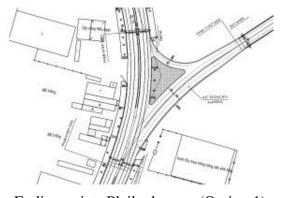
shows the design of the intesections between NH19 and the bypasses in which traffic and safety control measures included
